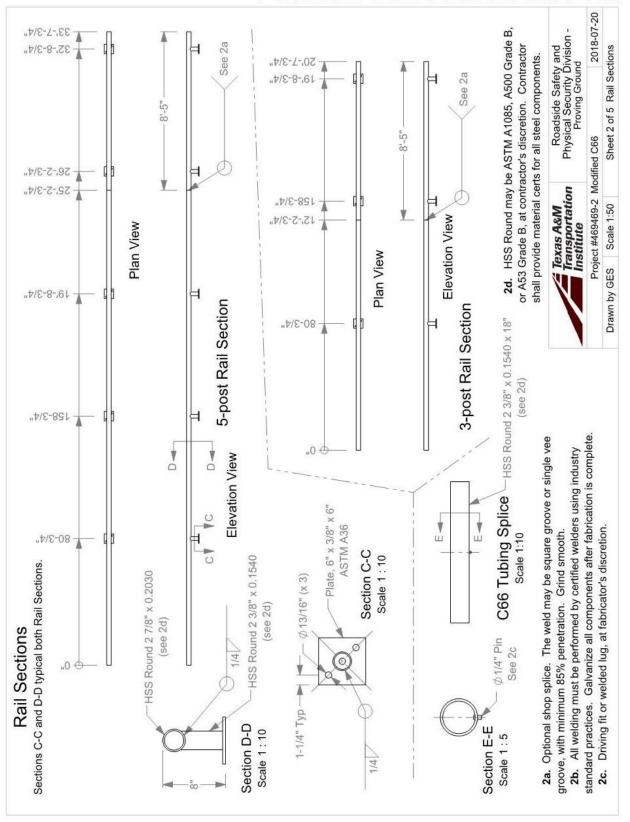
DETAILS OF THE MODIFIED C66 BRIDGE RAIL
